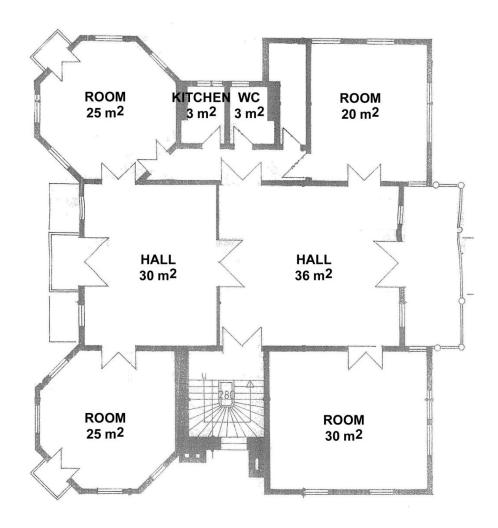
16 Ismail Pasha Mansion, The First Floor.
